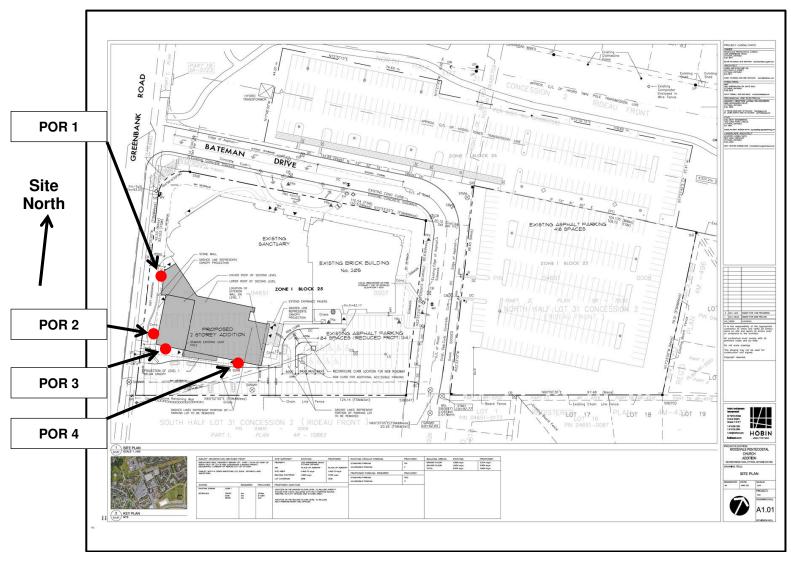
Ground Floor Plan showing Points of Reception (Source: Hobin Architecture Inc.)
